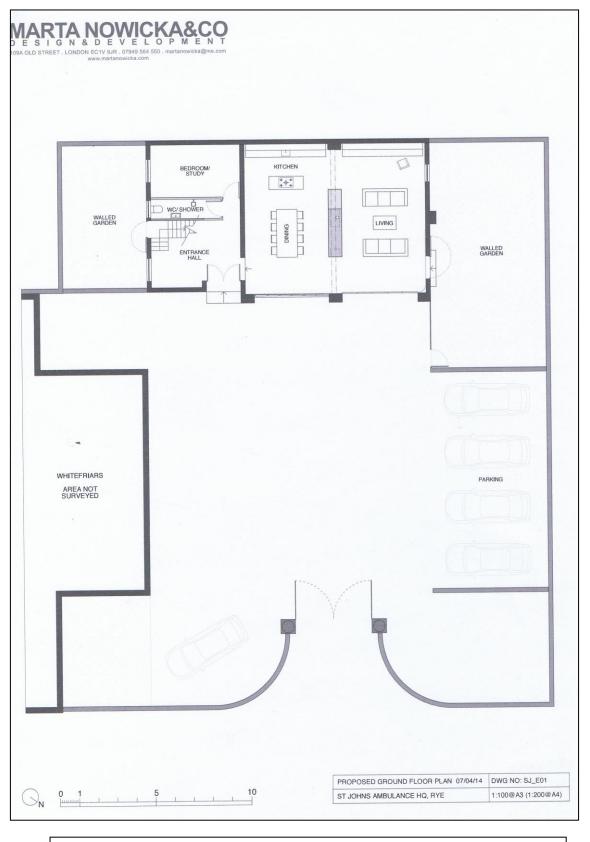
St Johns Ambulance Building, Rye: Proposed Development Plan
